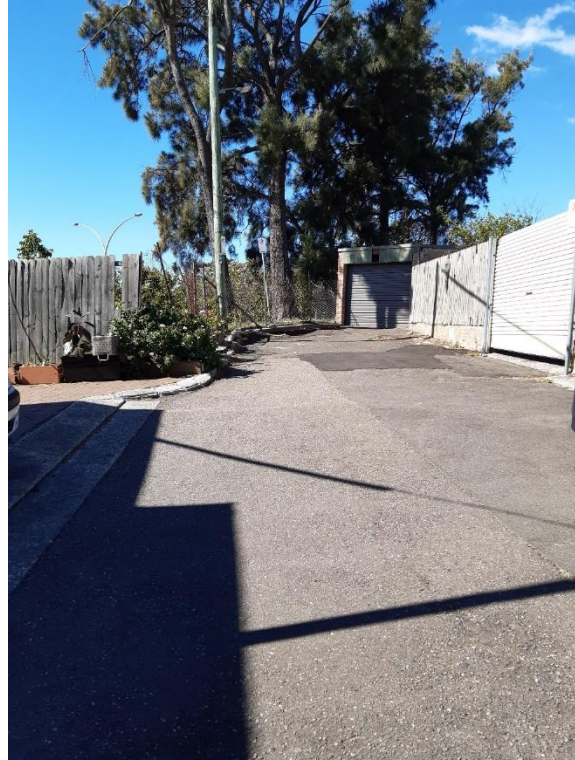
Proposed Location of RMS noise wall at North Eastern end of Chandos Street adjacent to Warringah Freeway
